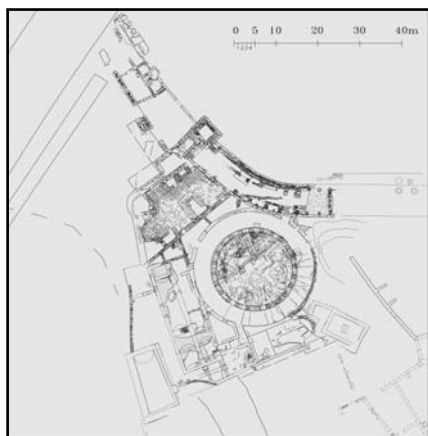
Plan of Byzantine palatial complex after 2006 excavations
